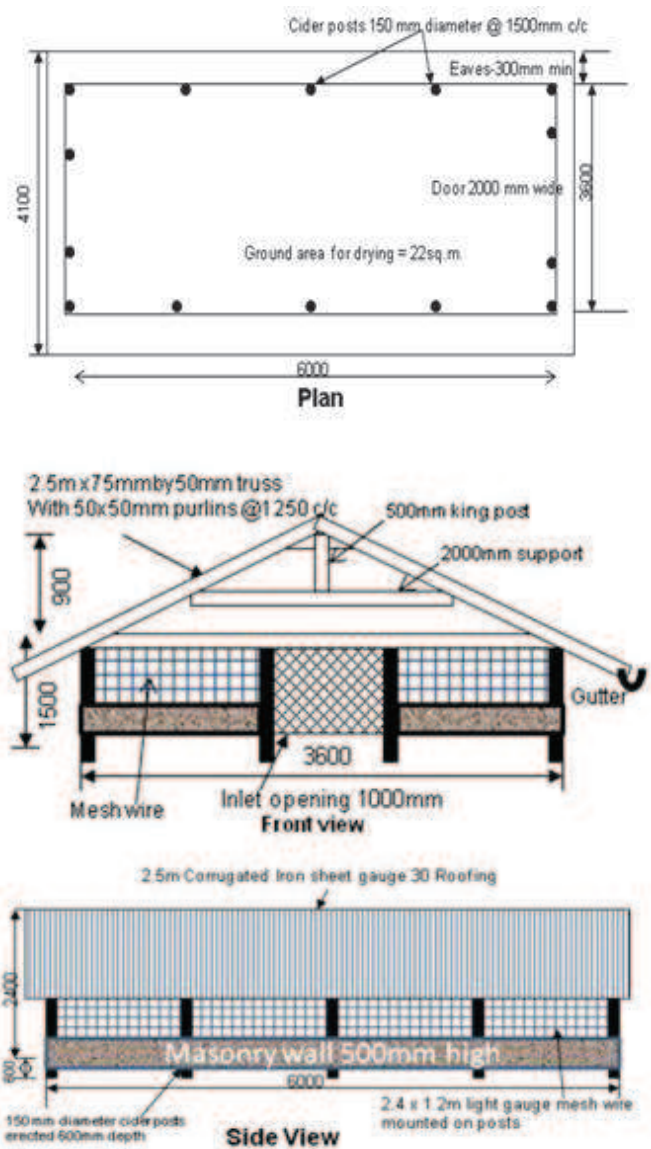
Plan, front section and side view of drying shed for faeces from UDDTs at Crater View Secondary school (Source: Muchiri, 2009)
